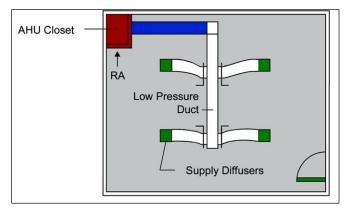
Typical layout of dedicated HVAC system serving classroom.
